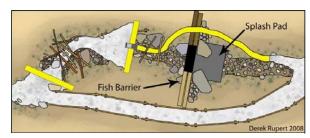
The fish barrier and splash pad will be built to integrate the large boulders that will act as an anchor.
